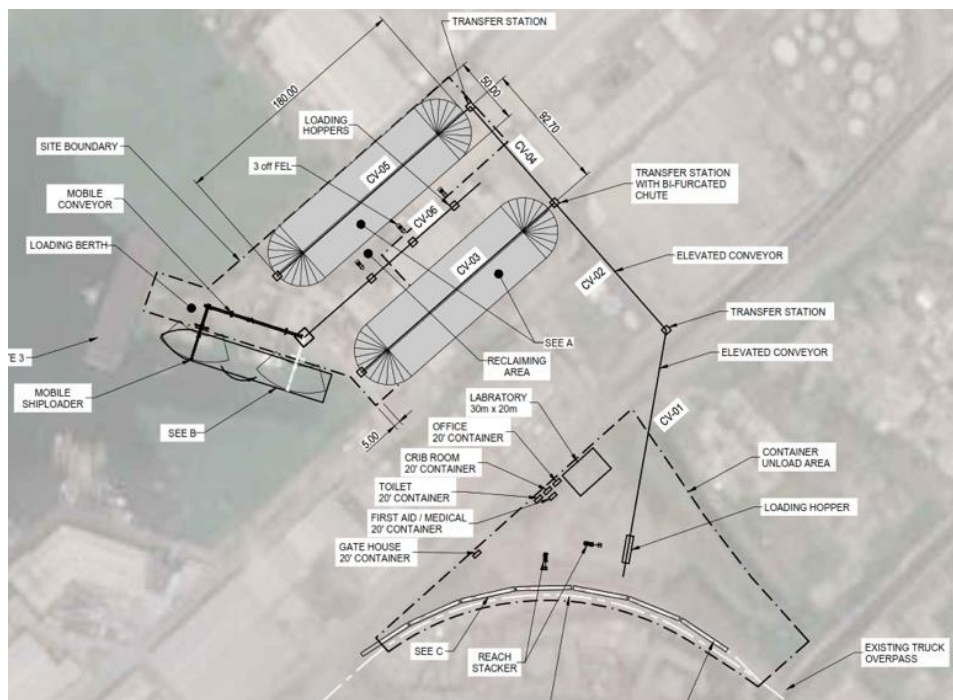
Train unloading, stockpiling and barge loading design at Douala port.
